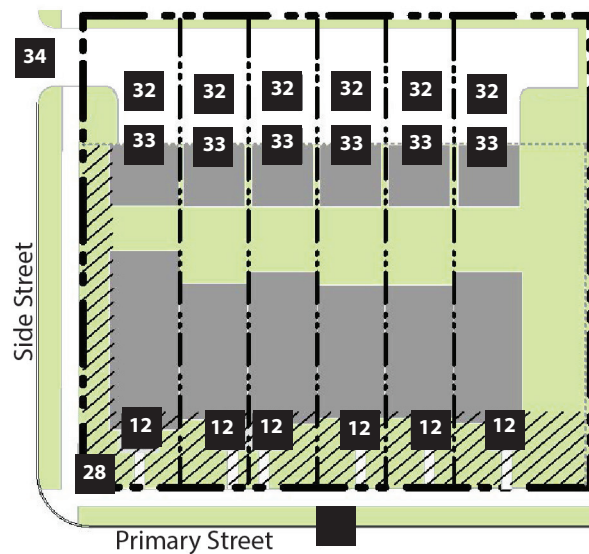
Row building siting diagram shown with detached garages and rear vehicular access. Not to scale.
